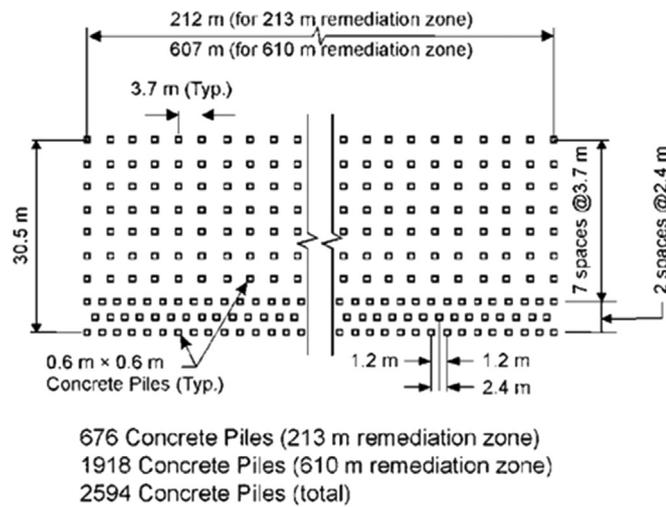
Plan view of pile remediation of Sardis dam [1].
